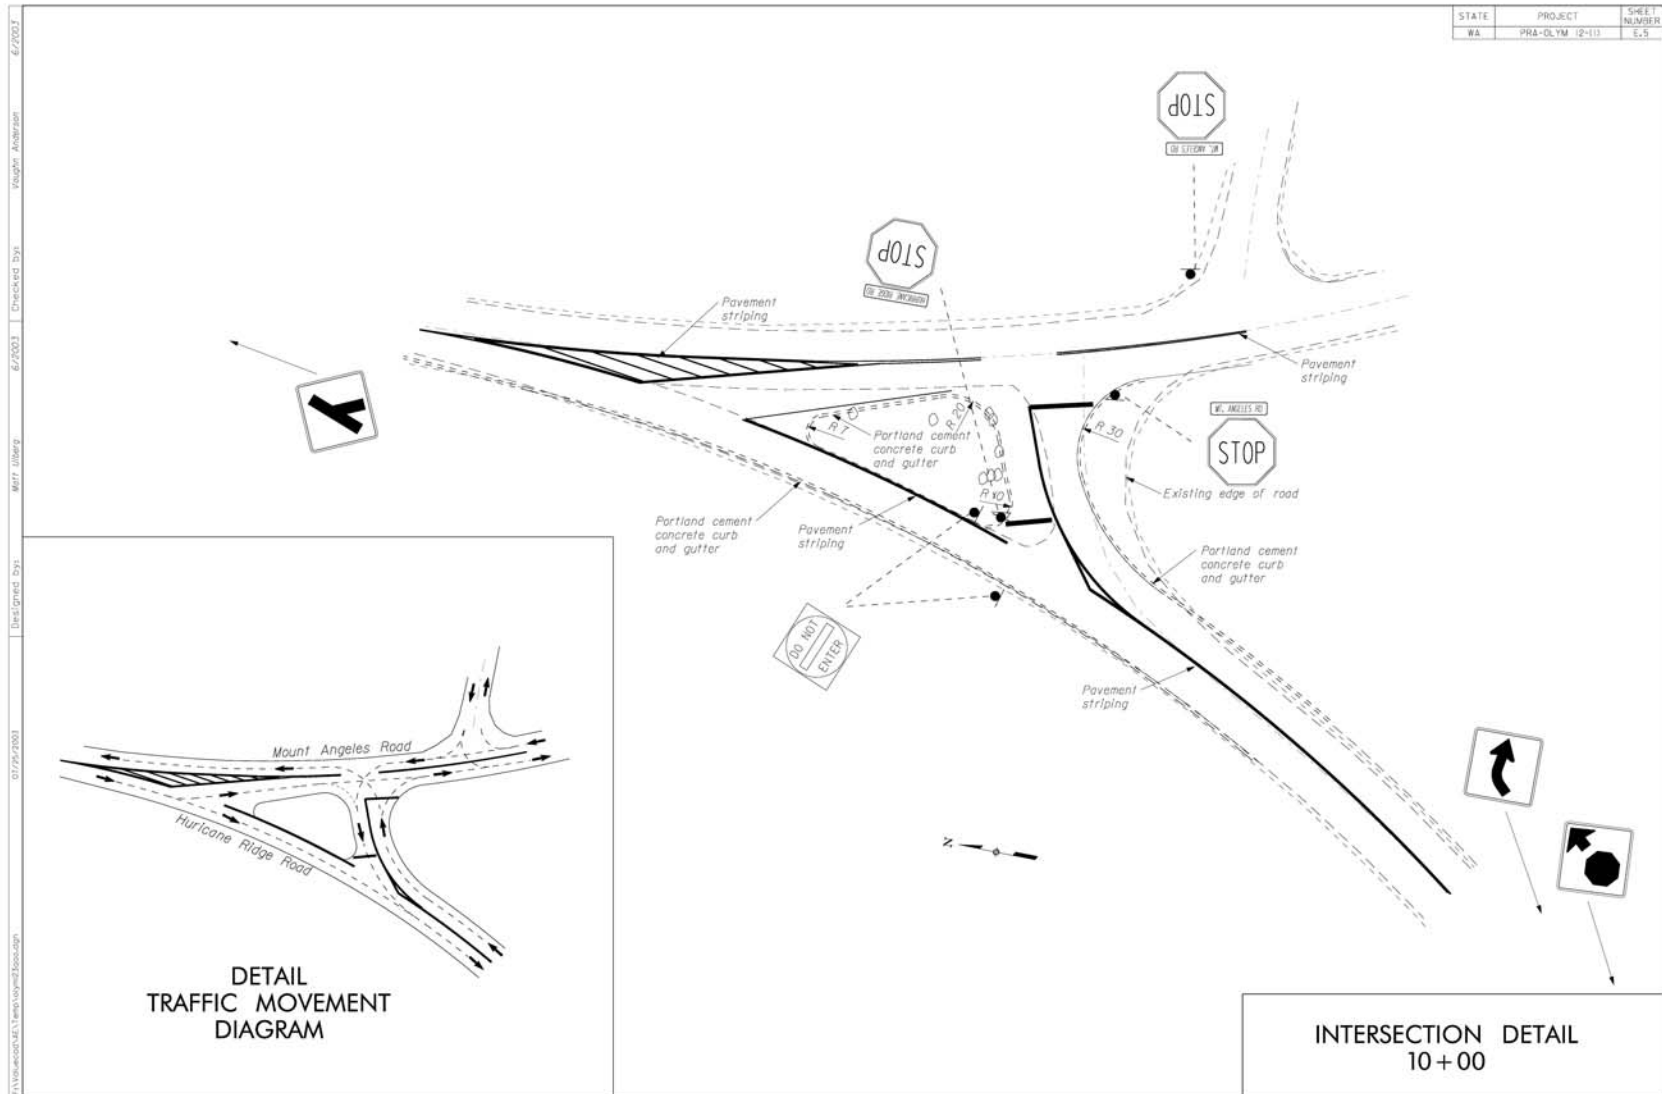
HURRICANE RIDGE ROAD / MOUNT ANGELES ROAD INTERSECTION PROPOSED RECONFIGURATION
